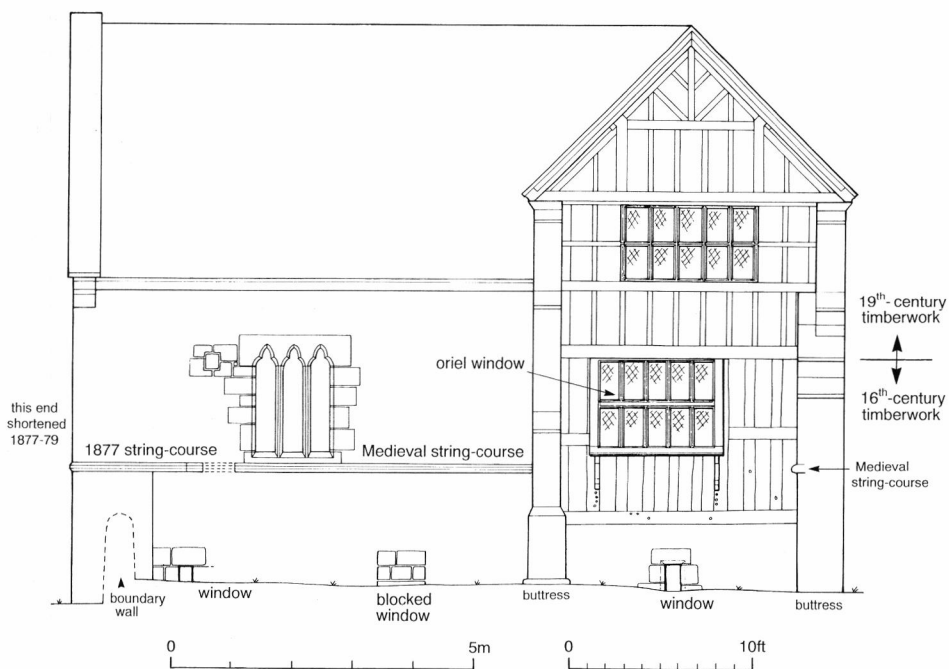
Breadsall Old Hall: southern external elevation, showing features ranging in origin from Medieval to 19th century (*cf.* Pl. 2); scale 1:125. *Drawn by R. Sheppard.
